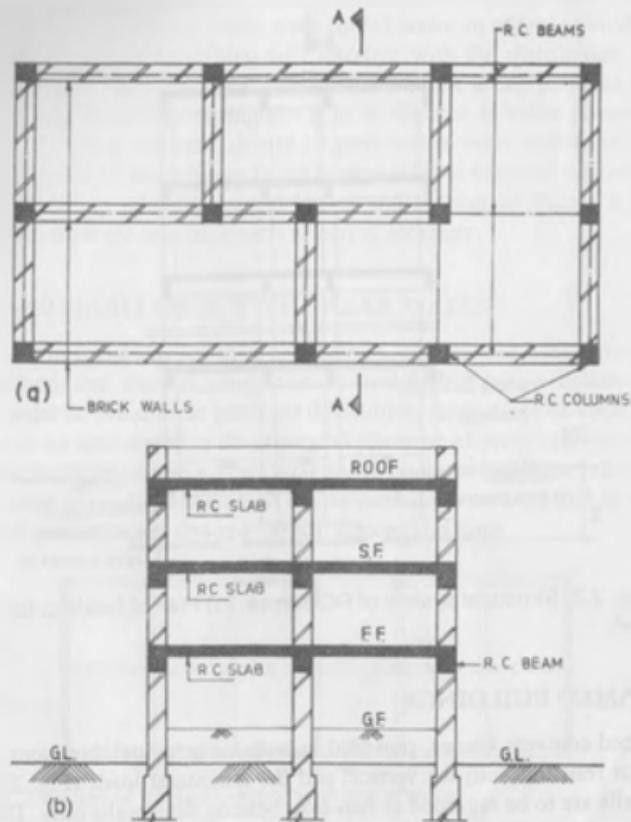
Twin system of brick walls and RC columns. (a) Plan of building; (b) Section A-A.
